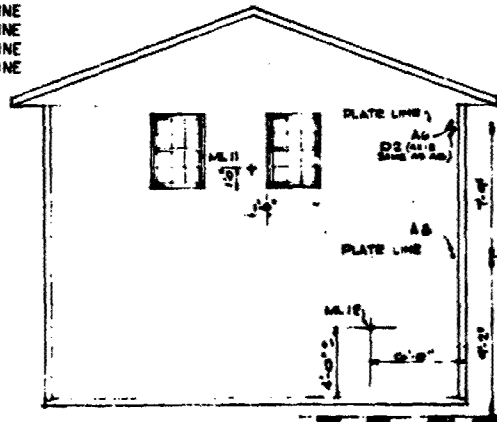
INSTRUMENTATION LOCATION, STRUCTURE E-2 ELEVATION
